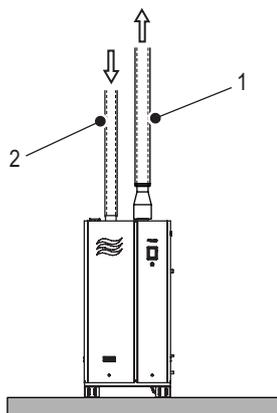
Type C6 Exhaust Venting for Room Seal Installations
